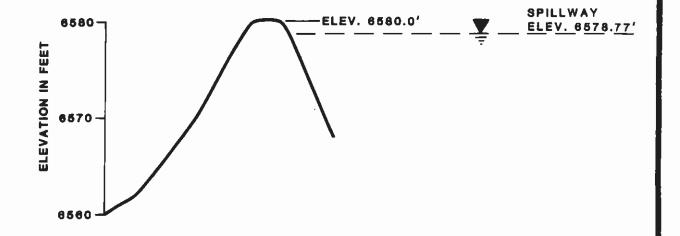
Spillway and Outflow Channel Cross Section N6-C
